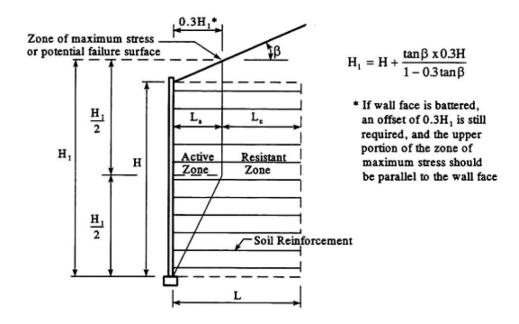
Potential failure surface location for MSE walls with inextensible reinforcement (Berg et al 2009).
